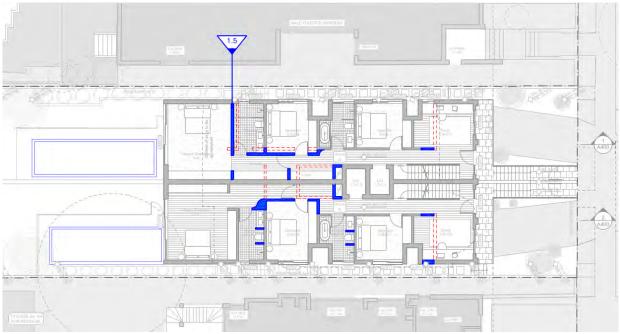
Ground floor plan of No.15A and B Lord Howe Street
